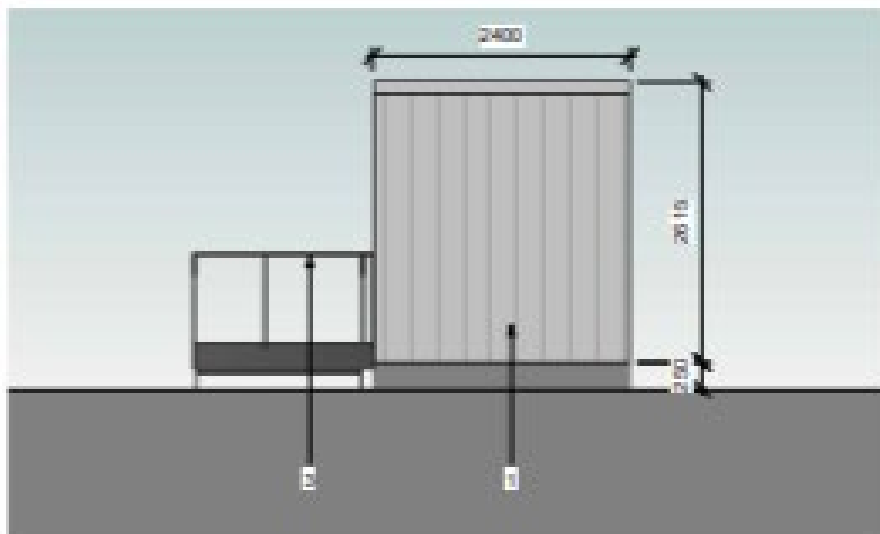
Modular Storage/Workshop Unit South Elevation
